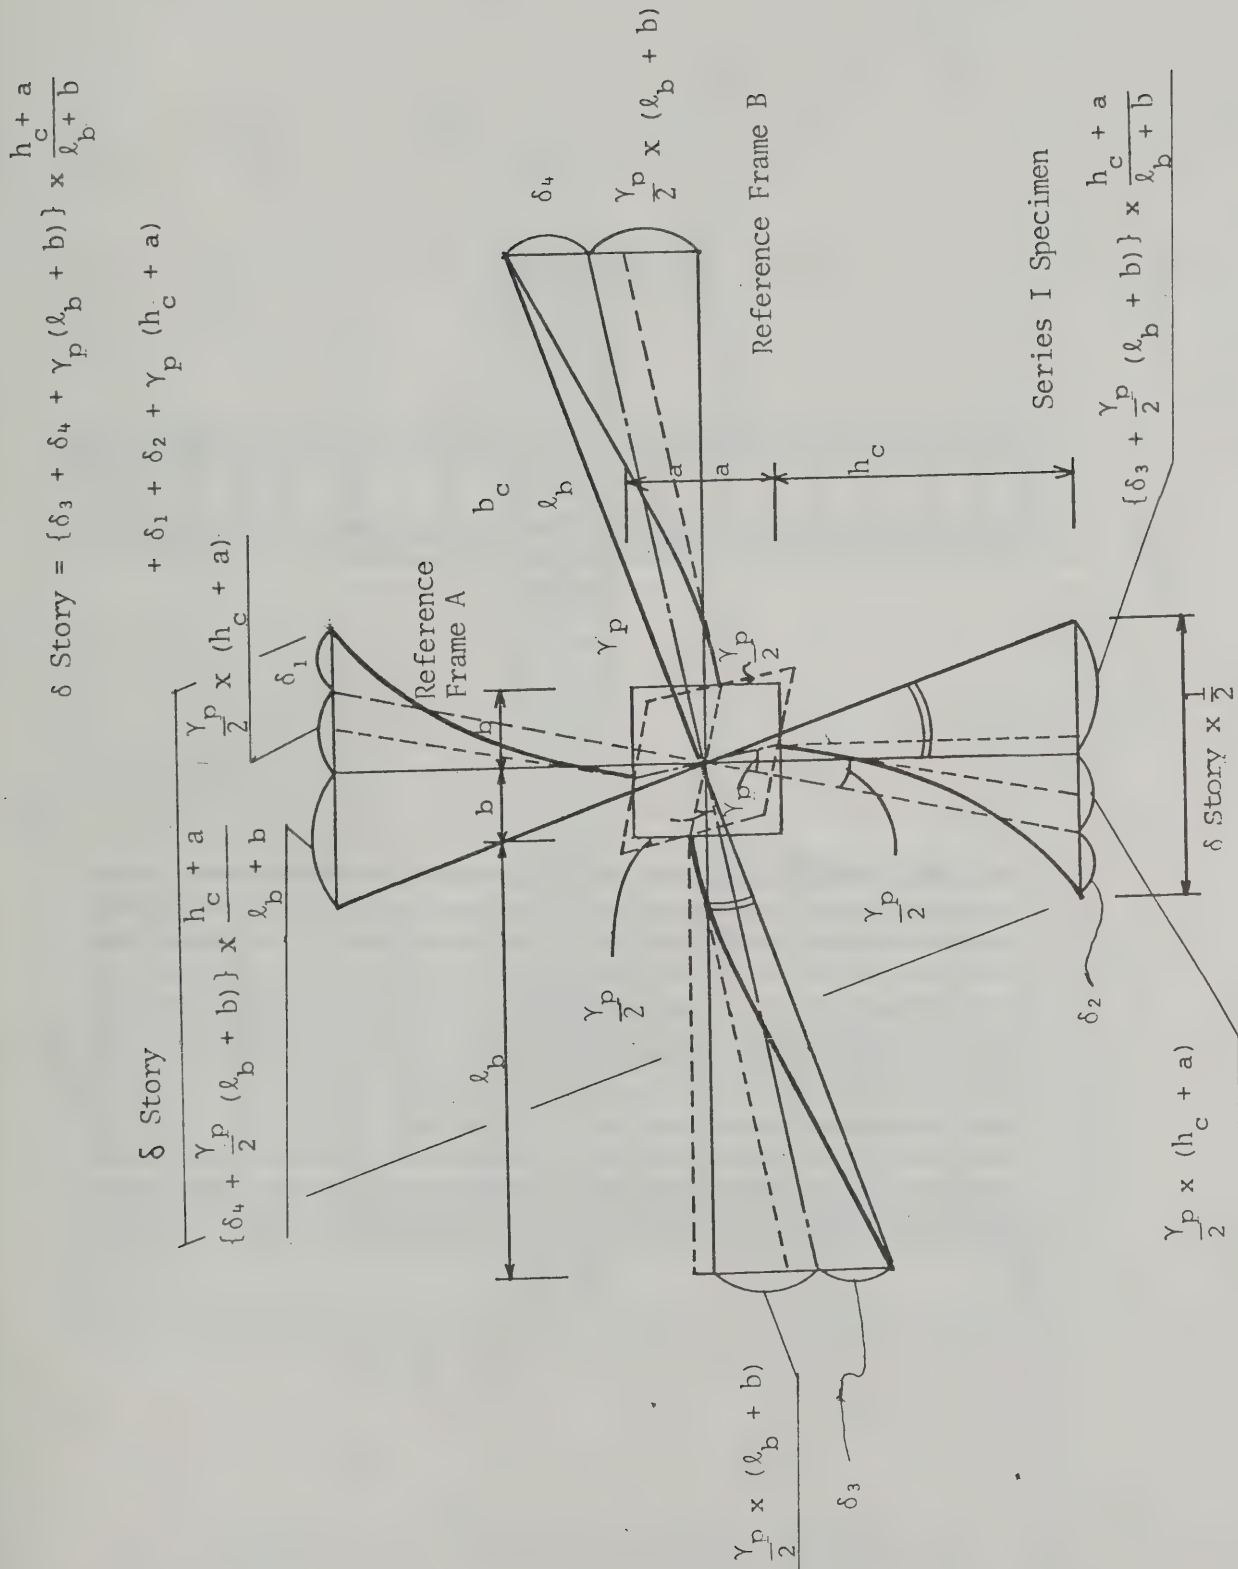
Column and Beam Deformation Measured from Face of Beam-Column Joint Panel
